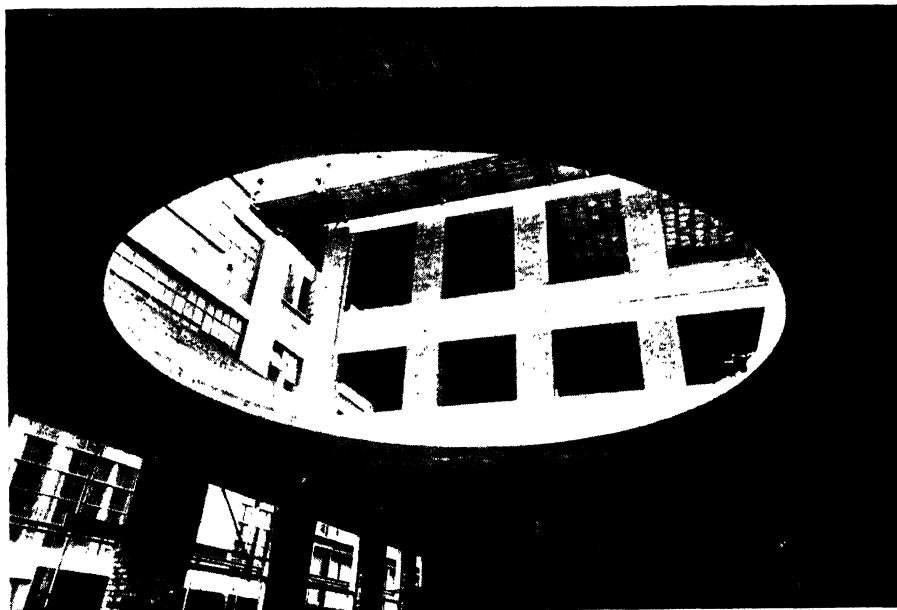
CONCRETE FLAT TO TAKE GLASS DOME
